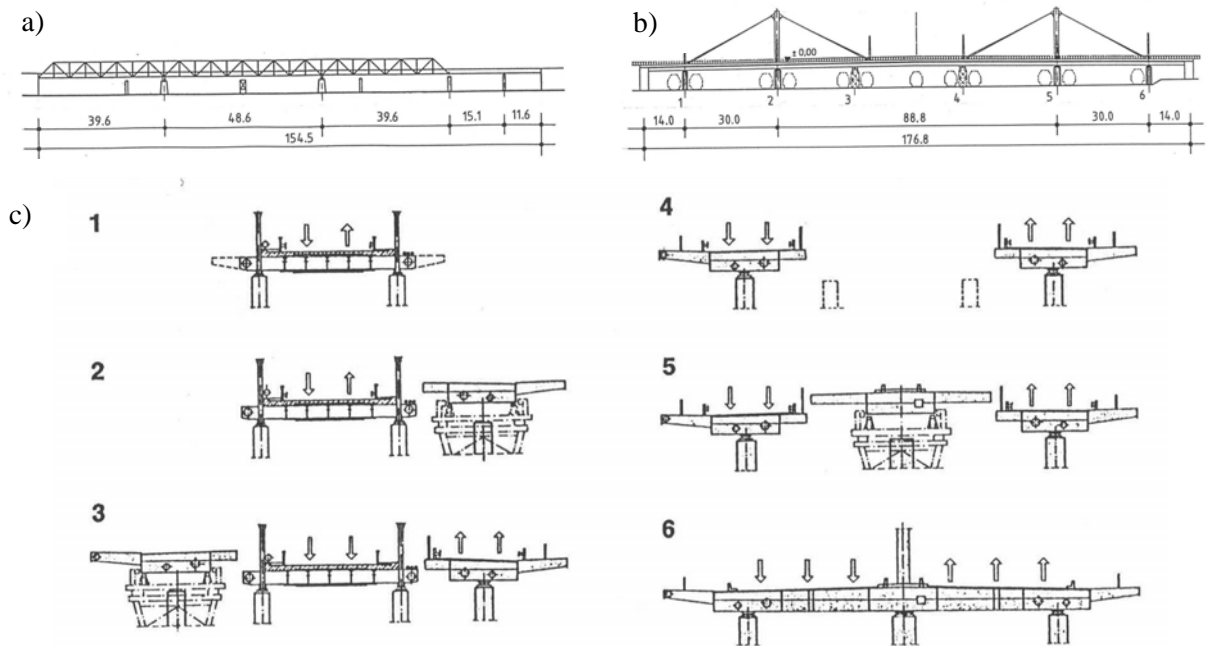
Heinrich-Erhardt-Steel Bridge at Düsseldorf: a. Old bridge; b. New bridge c. Construction sequence
